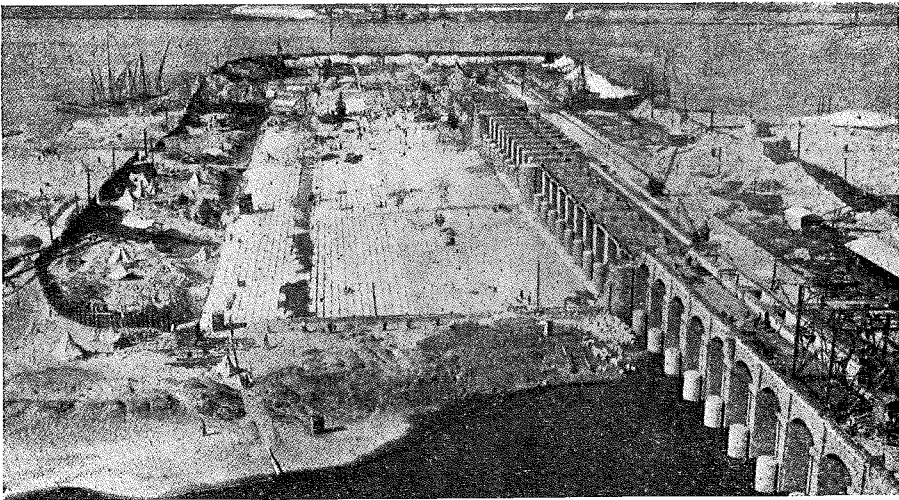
CONSTRUCTION OF SUDDS, NAG HAMMADI BARRAGE.
